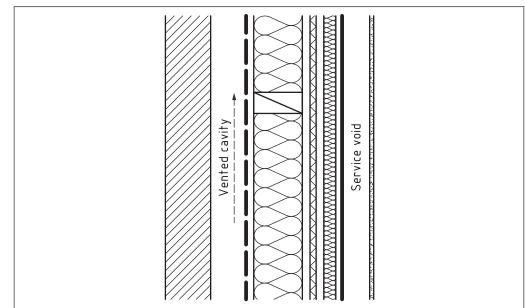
Framed wall – External sheathing – Thermal insulation between on the inside of the framing
